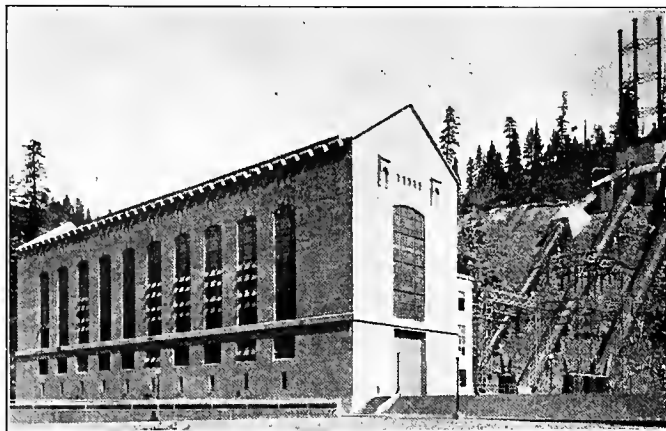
Pit No. 3, fourth of the Pit string of plants; 81,000-kva.
